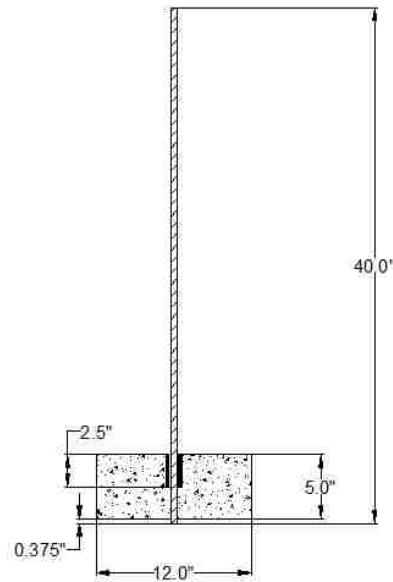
Schematic of #4 (No. 13) Bar Direct Pull-Out Specimen
